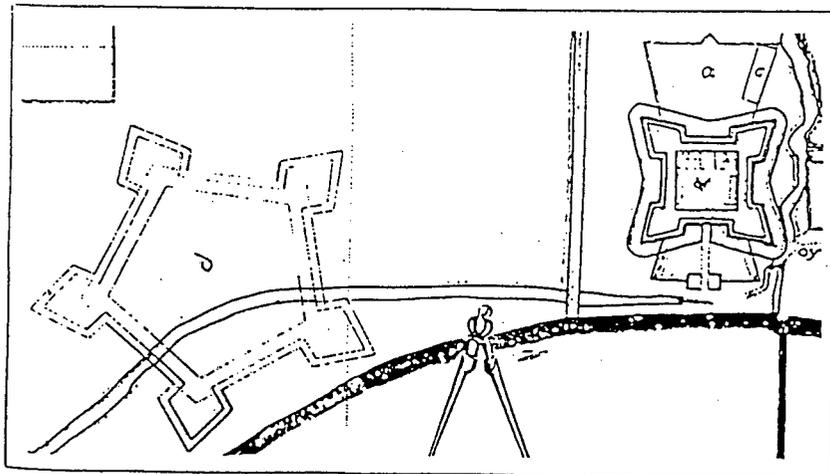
Plan of the Fort 1665, Cape Archives, M3/10.
